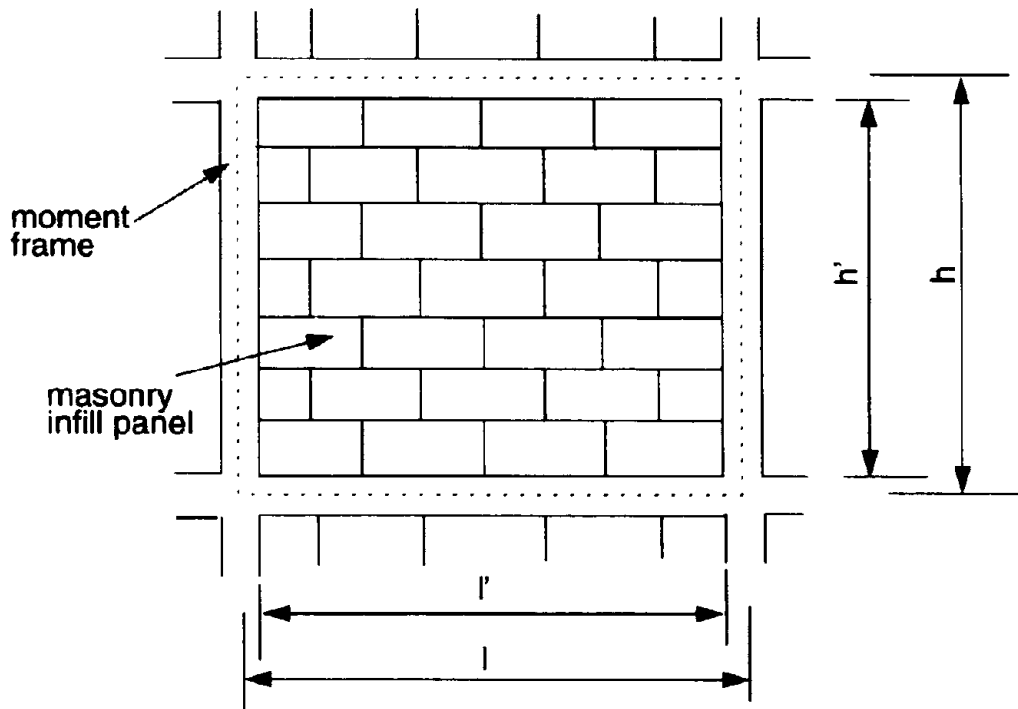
Masonry Infill Frame Subassemblage
